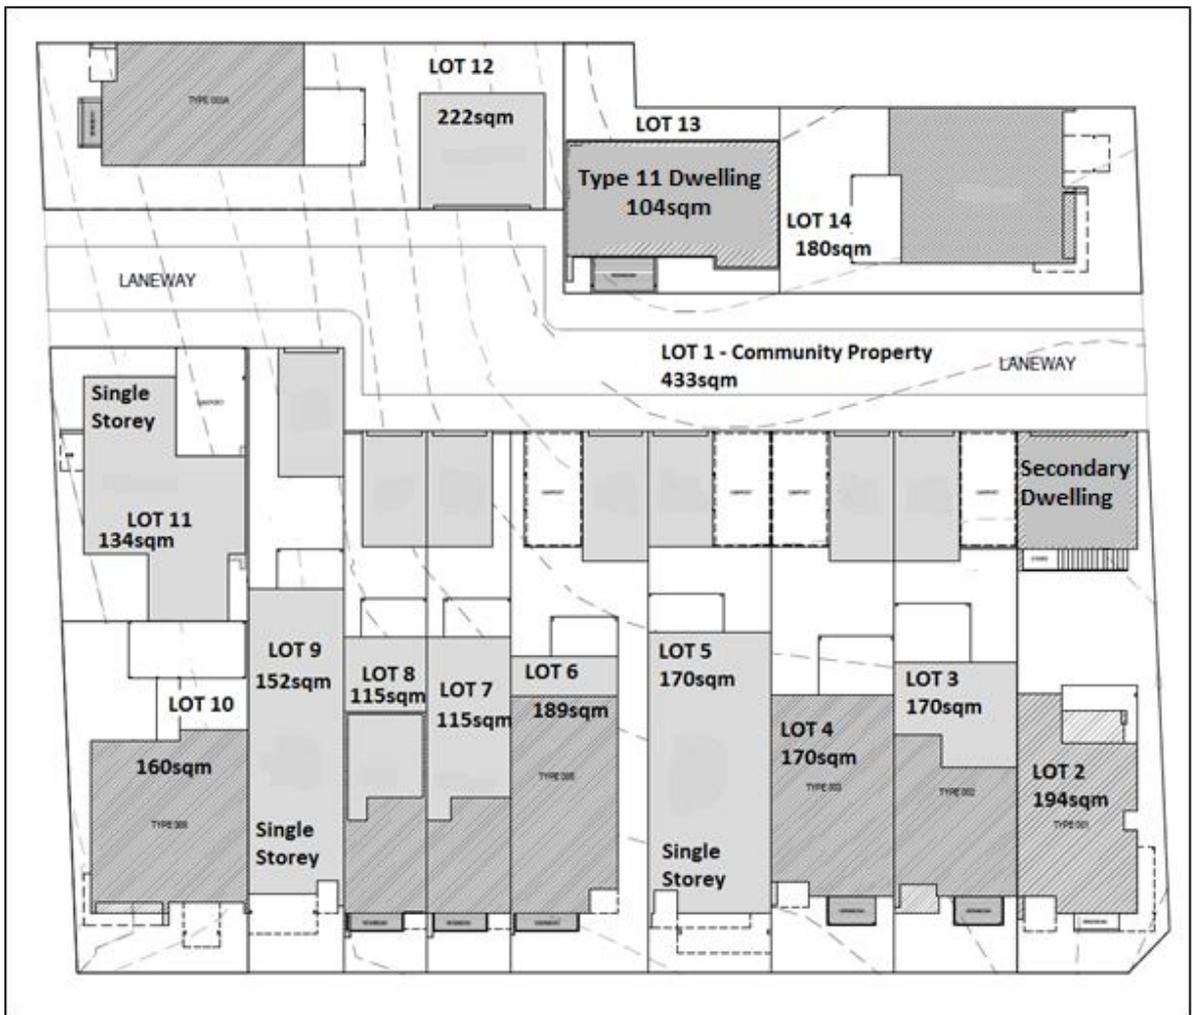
and 8 - Lot 784 – Subdivision and Dwellings (North and South)
